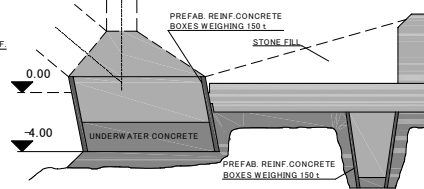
Foundation of Krk II Bridge arch on Krk Island
